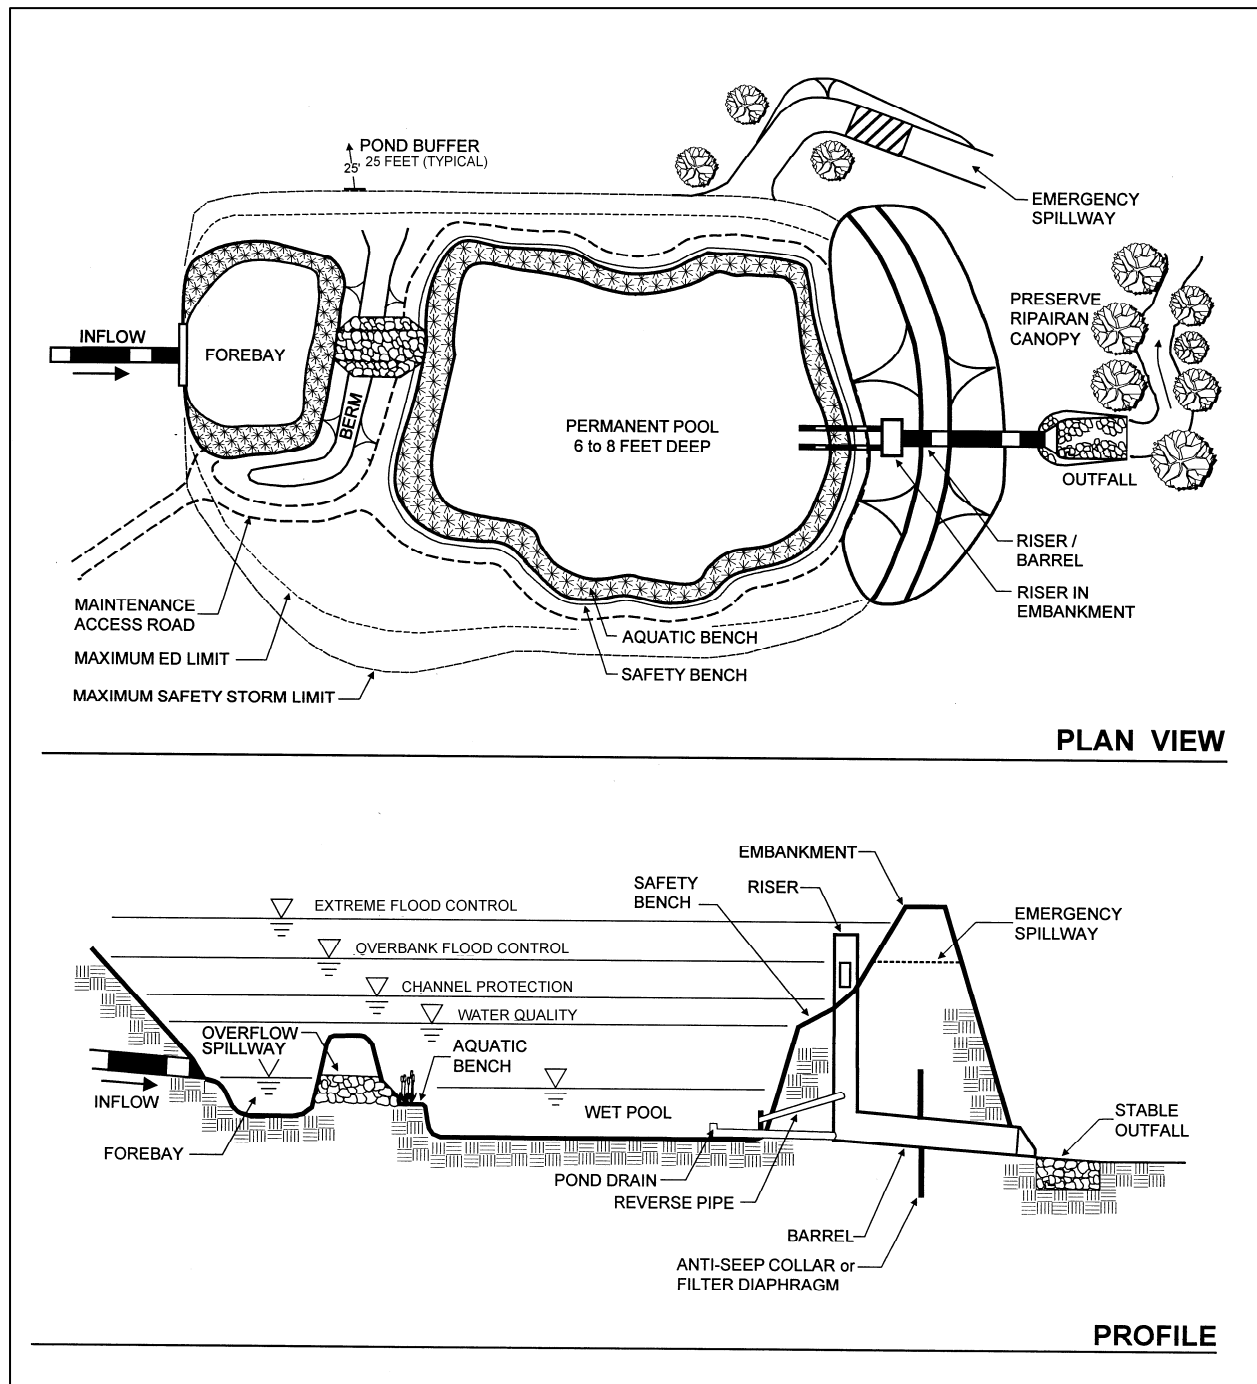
Schematic of a Typical Wet Extended Detention Pond
